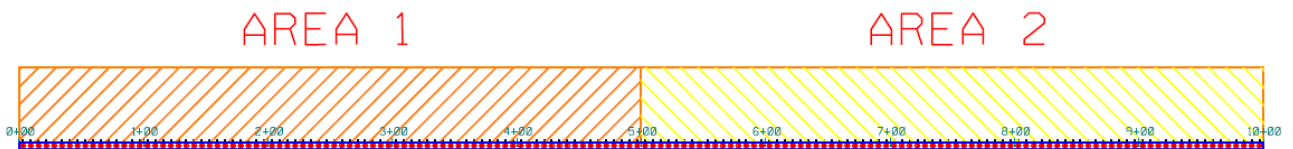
Plan view of the proposed construction site for the Scenario 2 with the work area divided in two.
